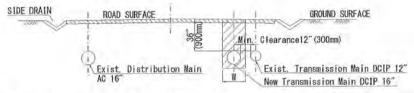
,3-3 Typical Section of Additional Water Transmission Main-2 (KB Bridge – Ngerkesewaol)
